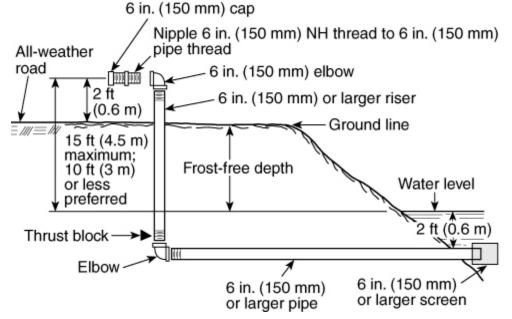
(b) is an example of a dry hydrant installation showing a minimum 6 in. (150 mm) pipe and screen. Installations can involve larger pipes and screens.
